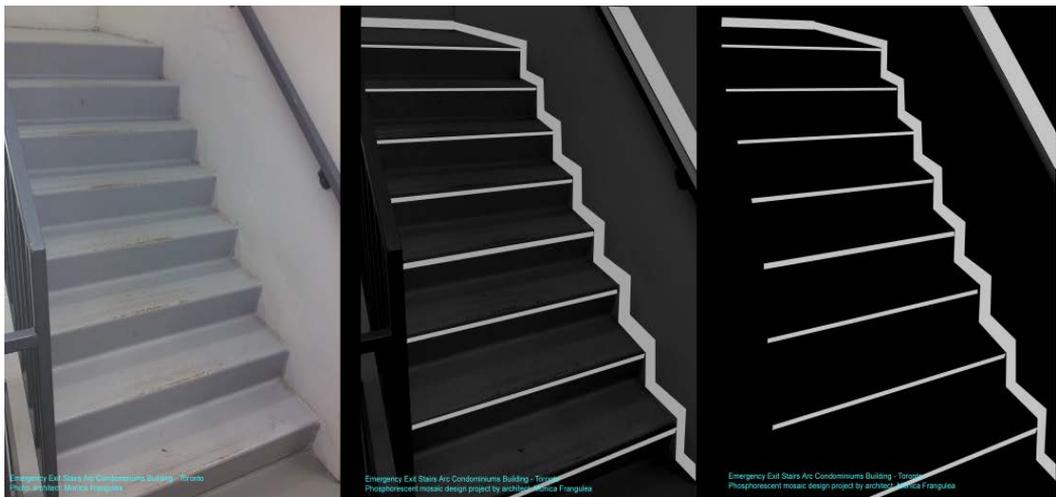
Emergency exit stairs Arc Condominiums Building – Toronto
